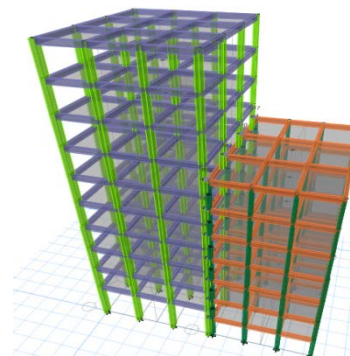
3D view of G+9 and G+6 storey buildings with gap element
